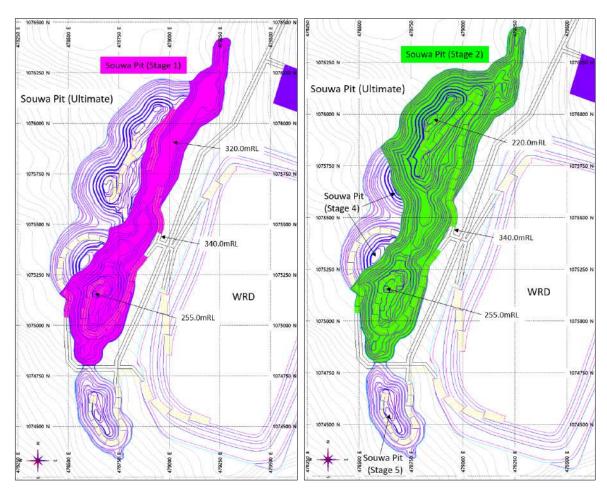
Souwa Stage 1 Pit Design Figure 16.5.14 Souwa Stage 2 Pit Design
